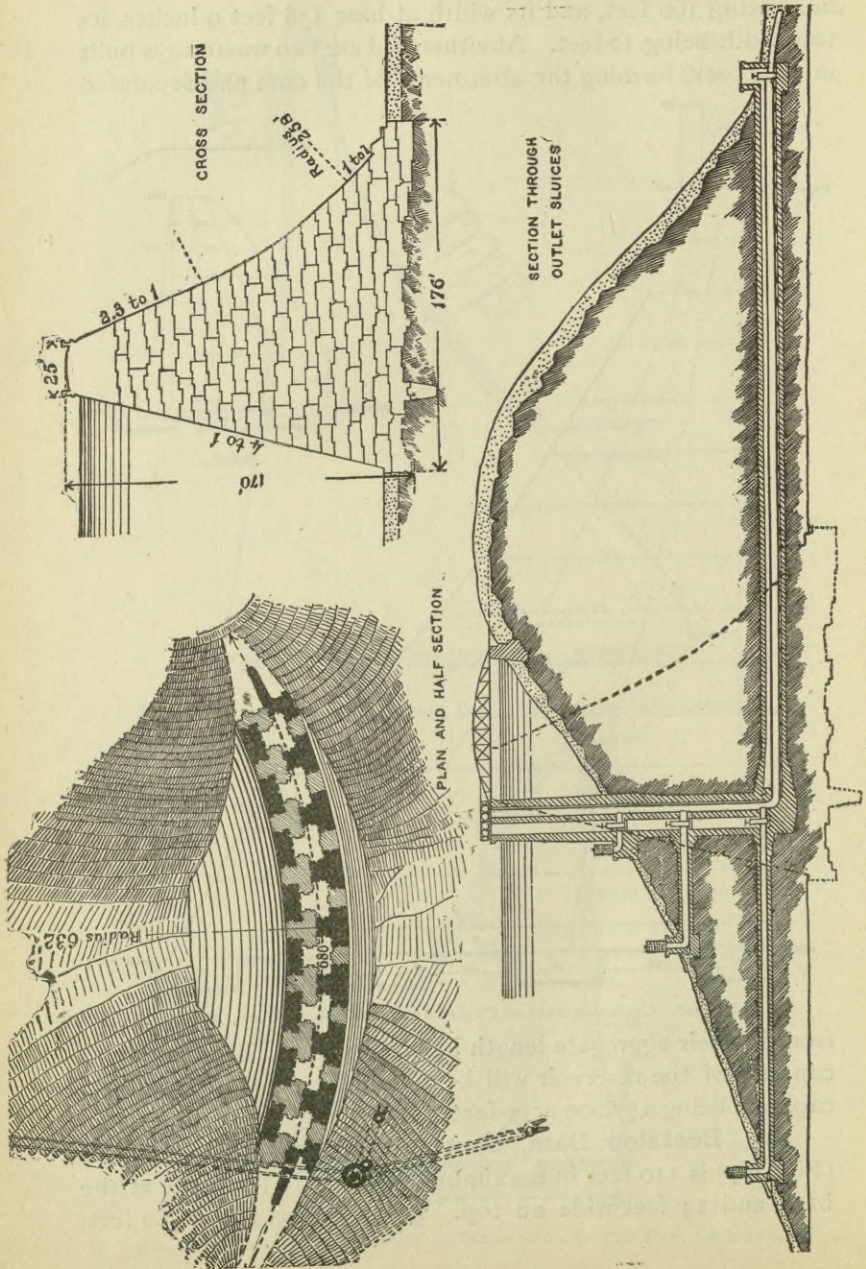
PLATE XXXIII.—SAN MATEO DAM. PLAN, CROSS-SECTION AND OUTLET SLUICES.
